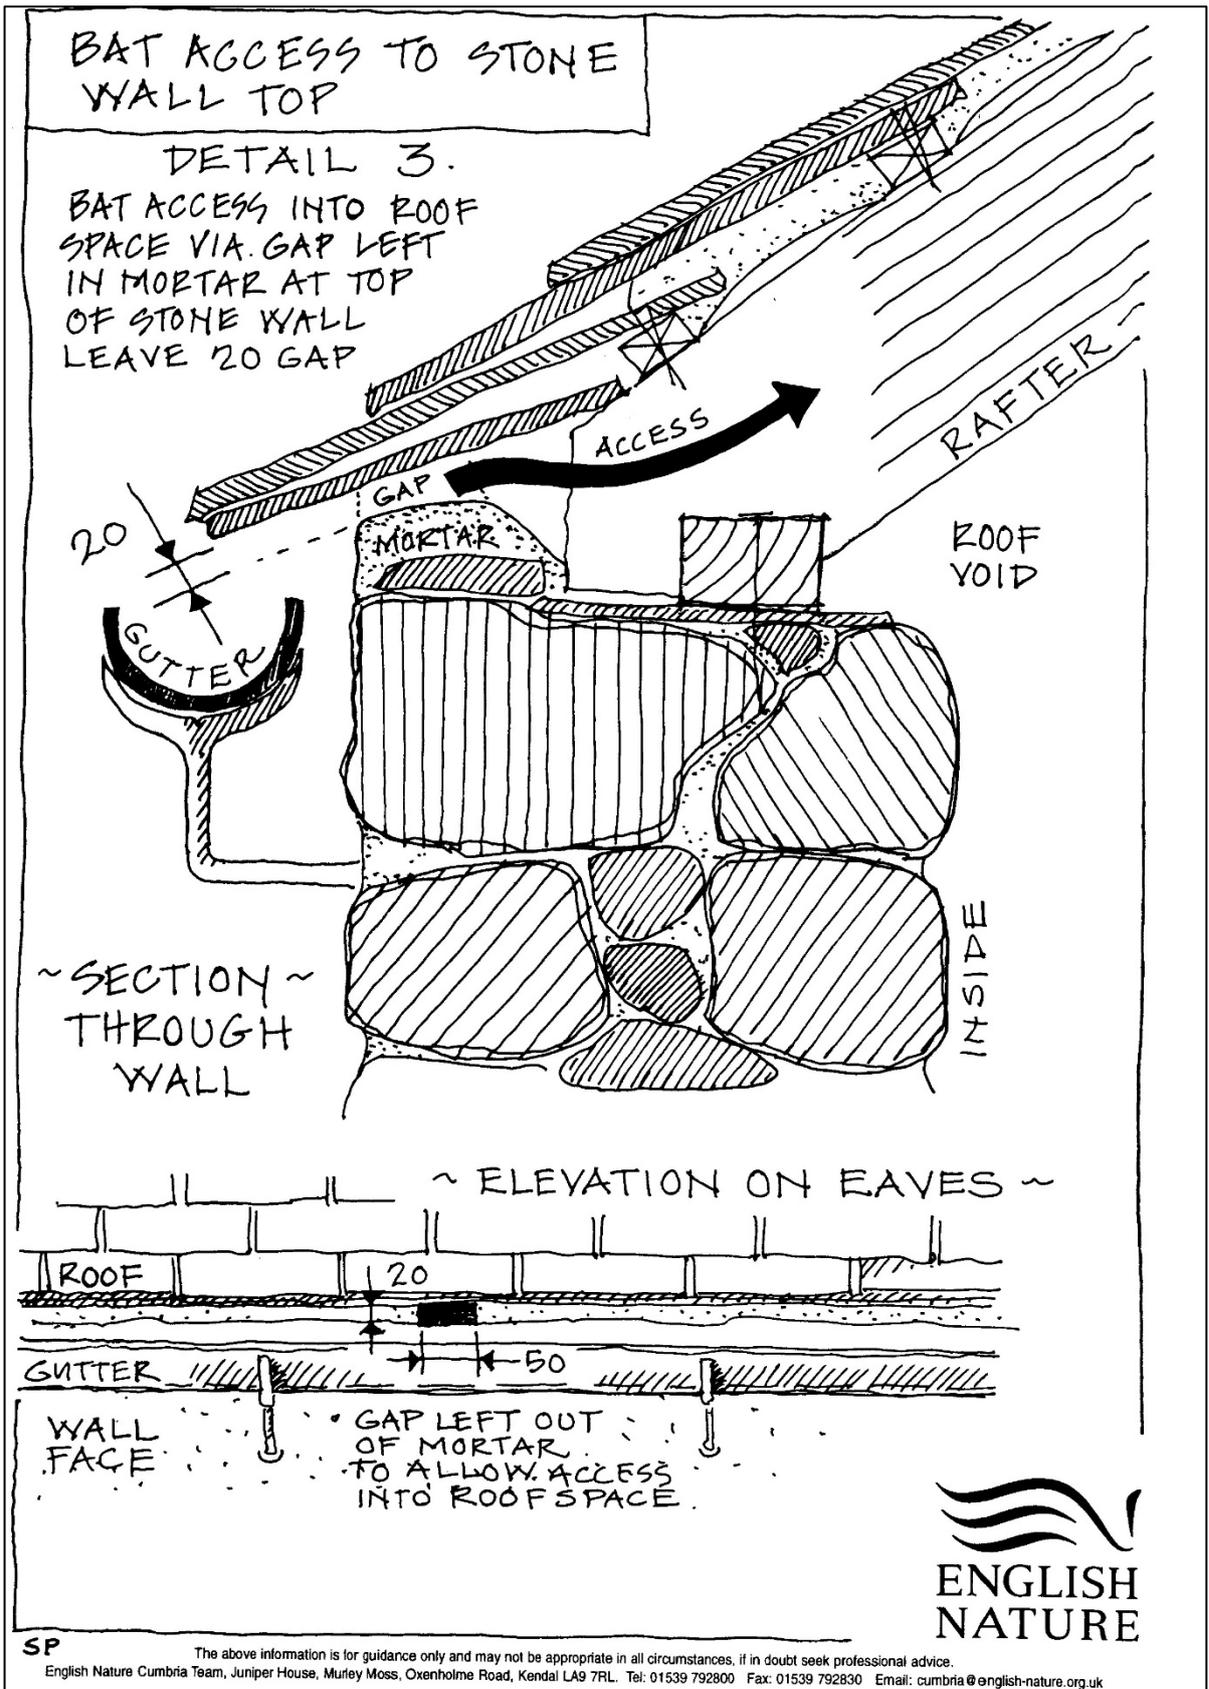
Example of new roost site creation, to be adapted for rendered walls and tile roof.
